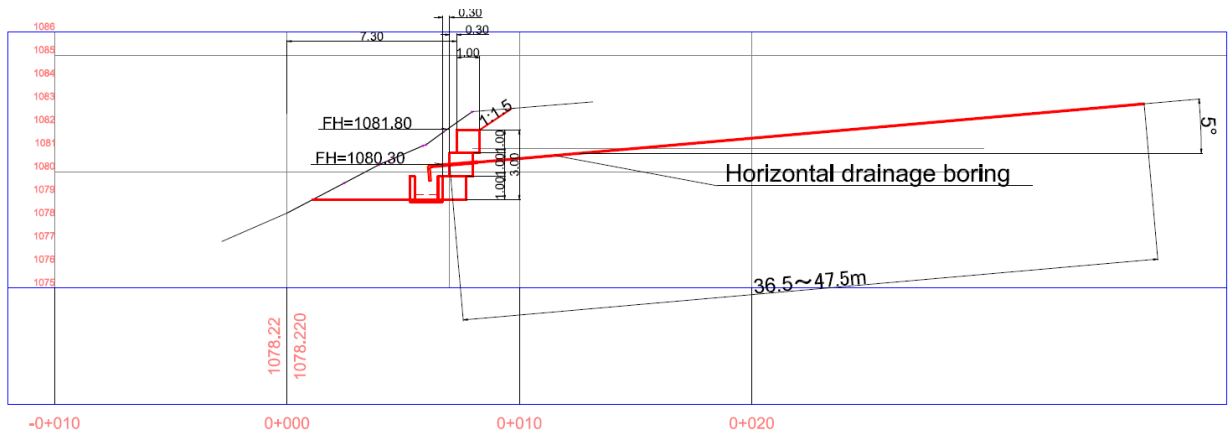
Structural drawing of Horizontal drainage boring (La Guillen)
